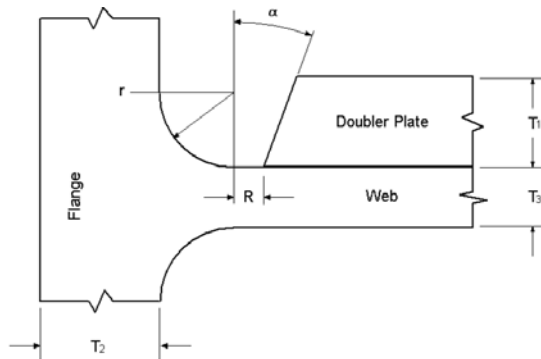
AWS D1.8 Doubler Plate Weld Definition
